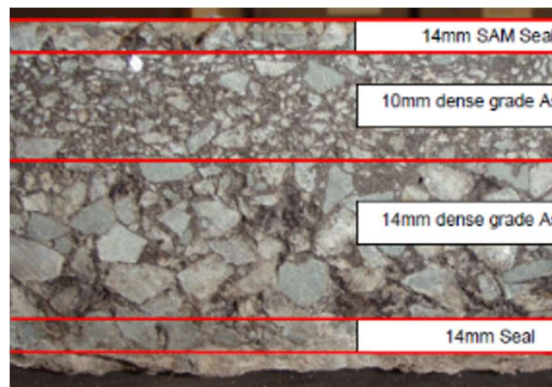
Core from Leach Highway between Corinthian Road and Vahland Avenue.
